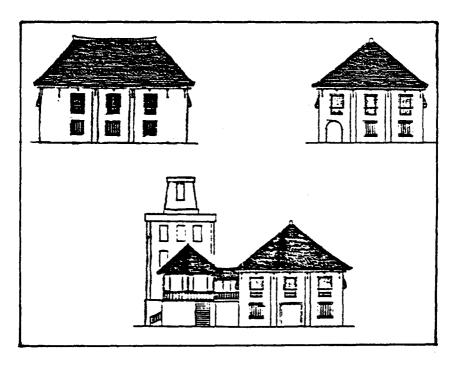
Reconstructed house Top, left: Elevation, House A; top right: House A front view: bottom: House A and B rear view
